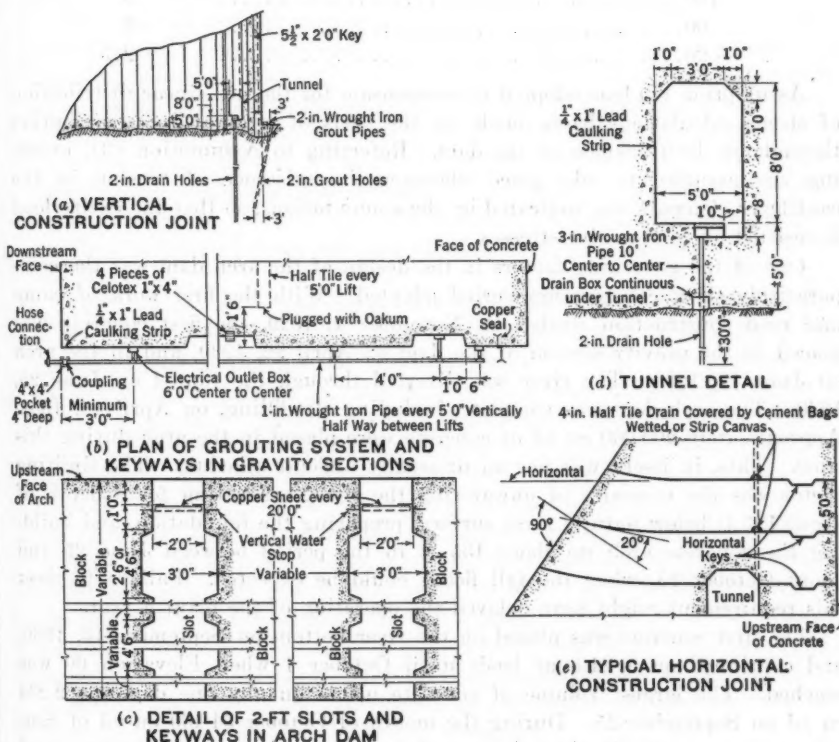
CONSTRUCTION JOINT AND GROUTING DETAILS.
